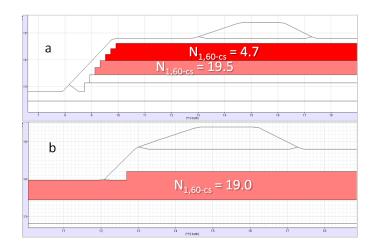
Zones assigned with UBCSAND and their corresponding liquefiability parameter: a – Most damaged section, with 30-foot berm; b – Typical section, without berm.
